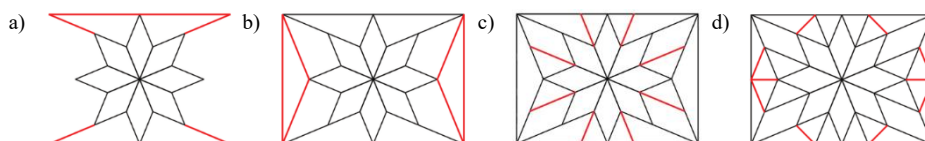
Constructing the plan of the diamond vault: a) determining the bay length; b) defining the corner line; c) extending the inner sections; and d) drawing the final outer sections
